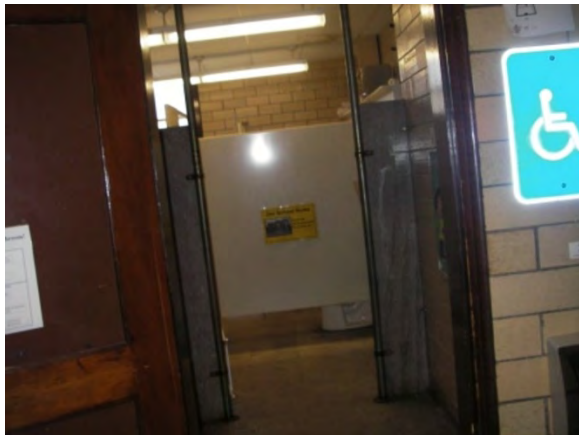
RESTROOMS INCLUDED MANY ADA HANDICAP ACCESS UPGRADES
